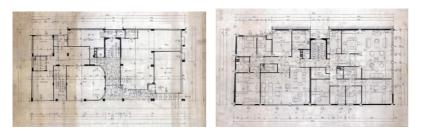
İlgen Apartments, Poyracık Street, Nişantaşı, 1976.
